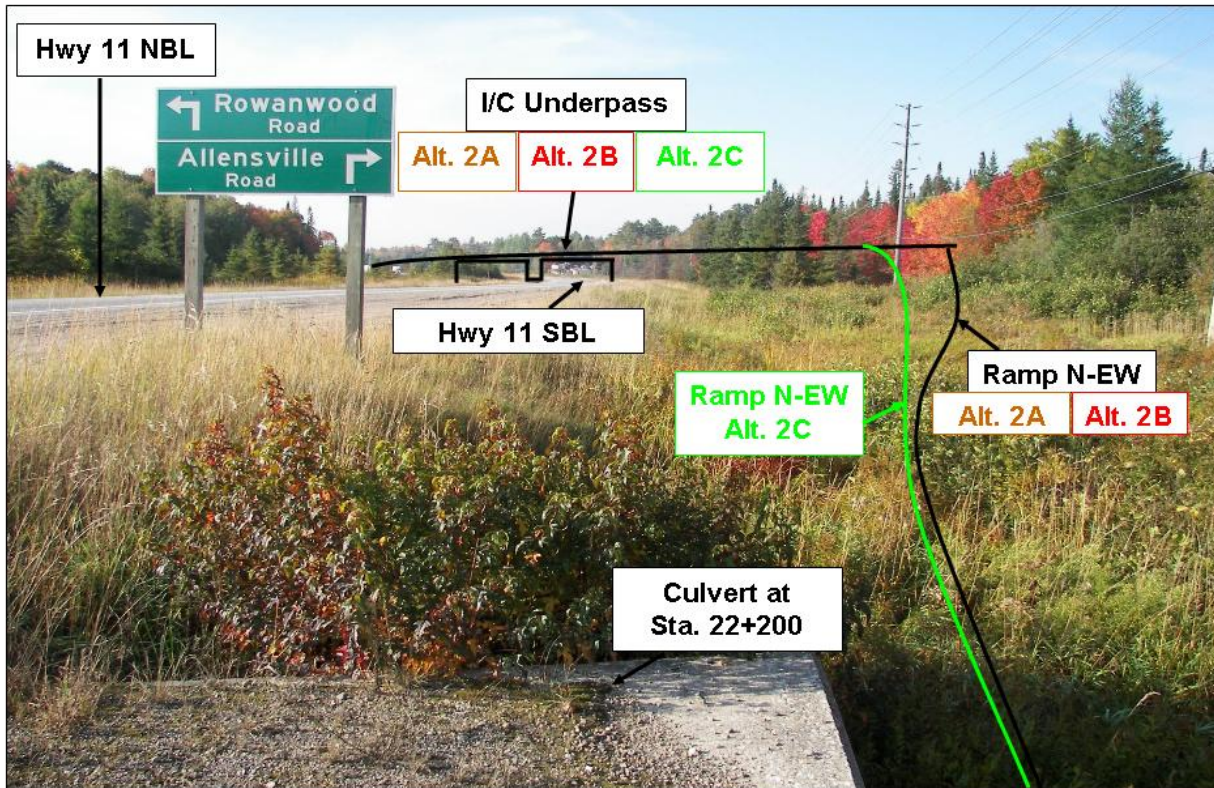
VIEW: Looking north from west shoulder of Highway 11 SBL from Sta. 21+970. Proposed ramps will require the extension of the existing culvert at Sta. 22+200. (Sept. 26, 2008)
